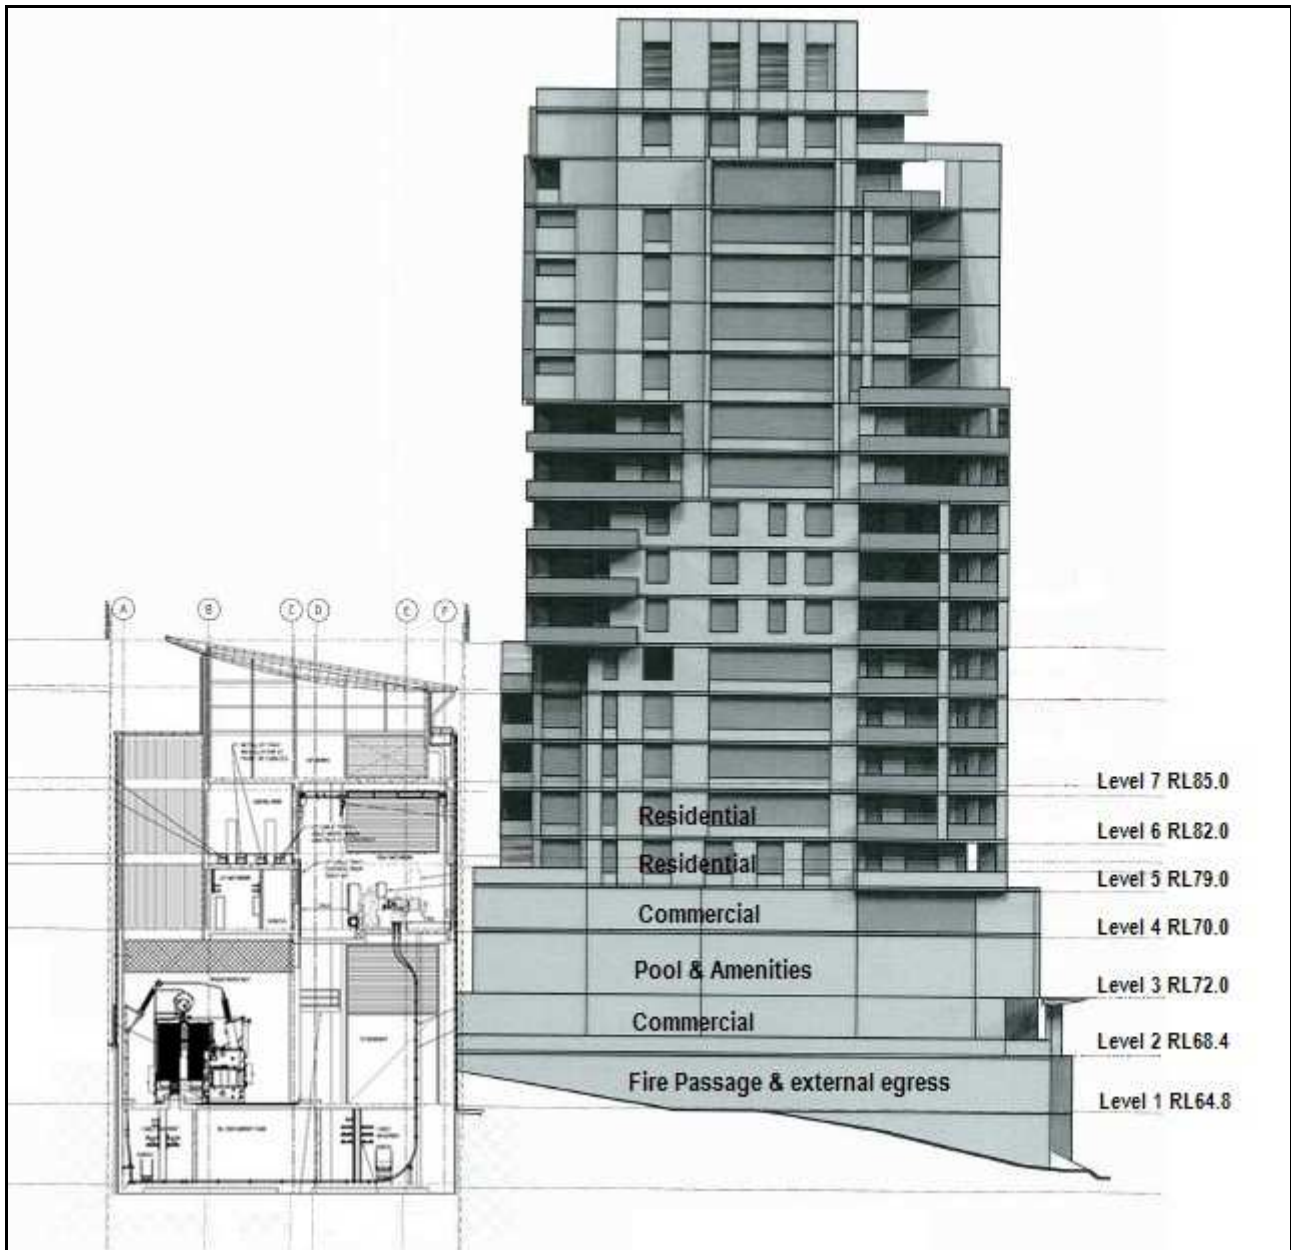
Proposed Mixed use Commercial/Residential Development by Castle Constructions
